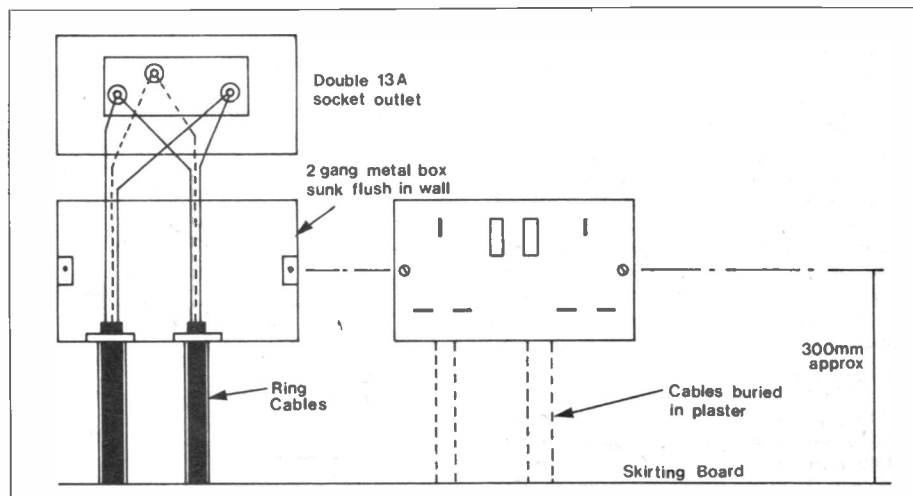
Fixing and connecting a ring socket outlet on the wall above a skirting board.
